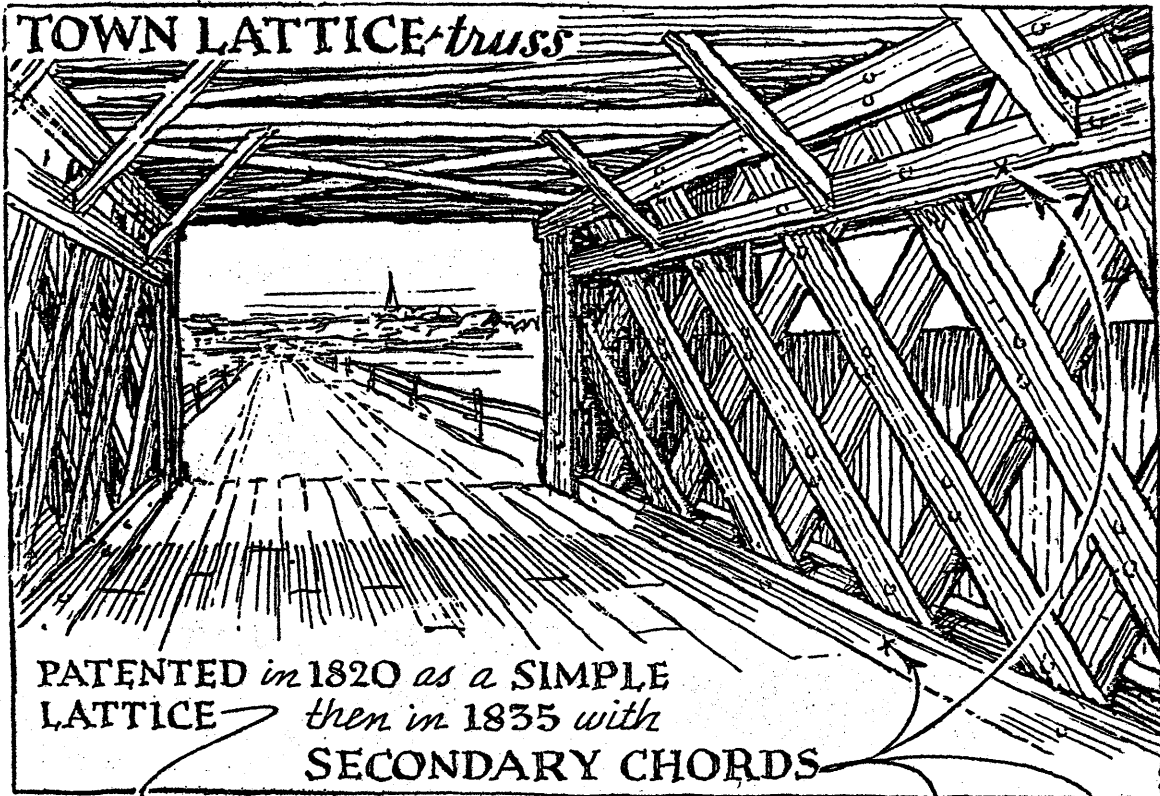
Details of the Town Lattice Truss (after Eric Sloan)
